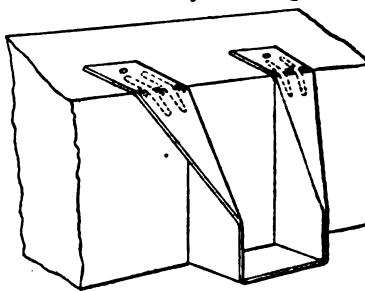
"Ideal" Wrought-steel Beam-hanger
